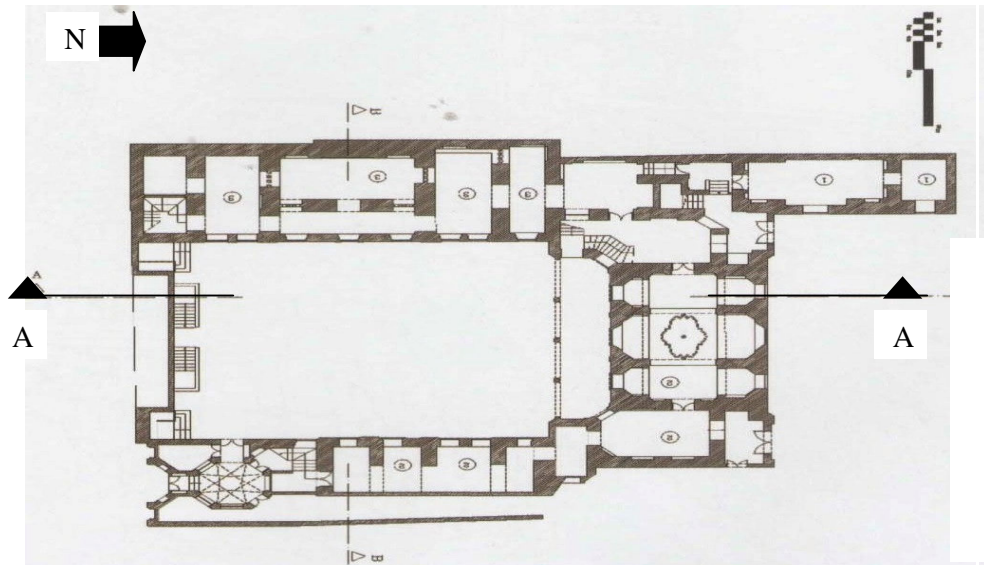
First floor plan of Gadaki House (Kleiss.W, 1995)
